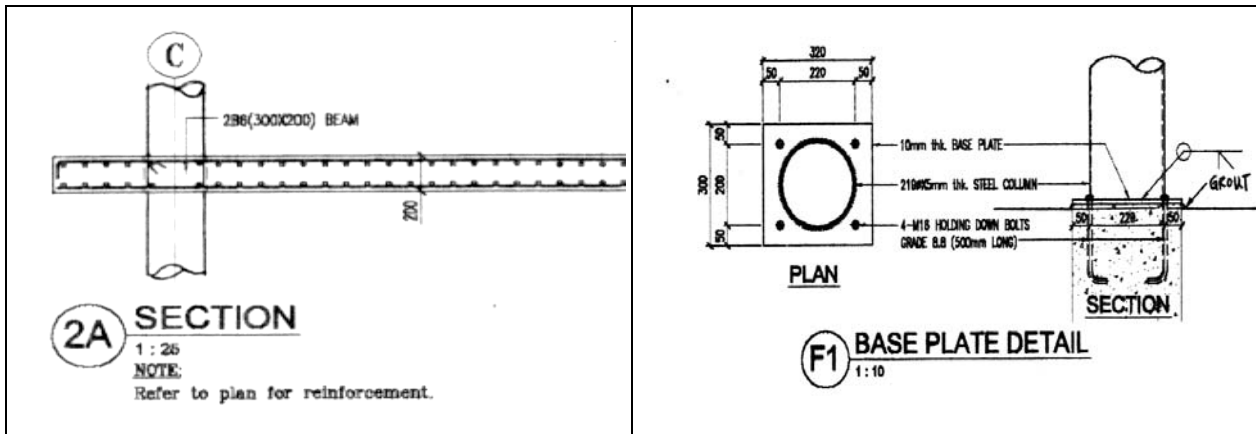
Hidden beam within column strip Figure 5.5 Base plate details for column
